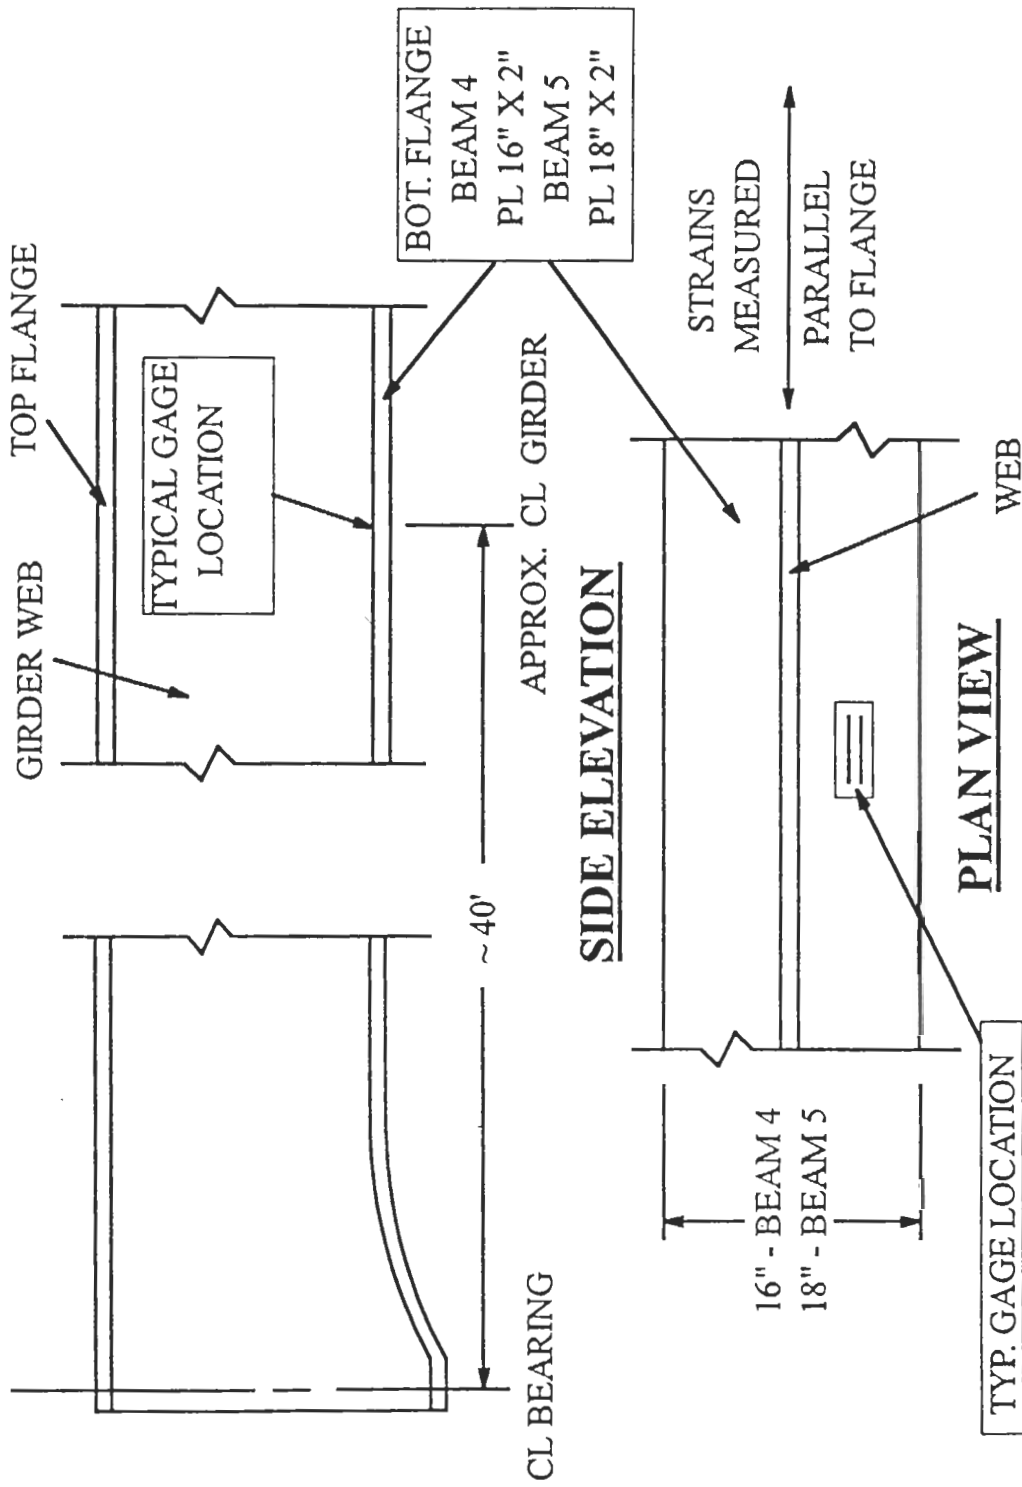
Route 8 Bridge - Detail With Strain Gage Location
